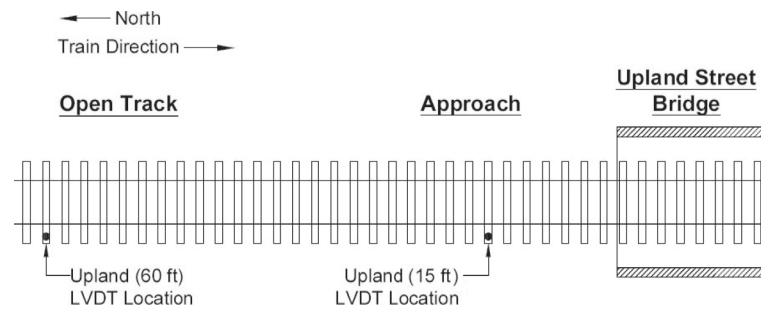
LVDT locations at NEC Upland Street bridge approach near Chester.
